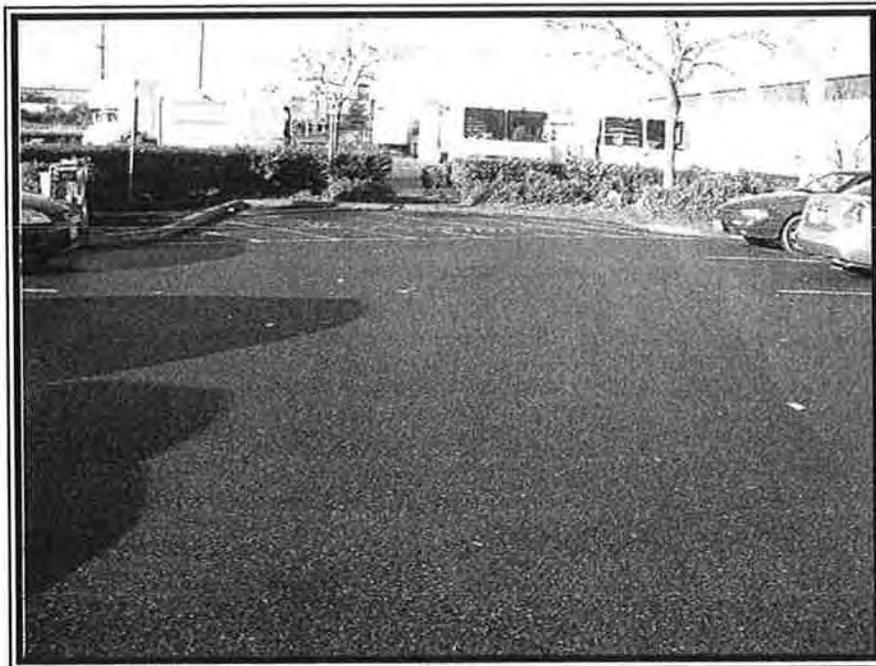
TRUCK SERVICE ROUTE
